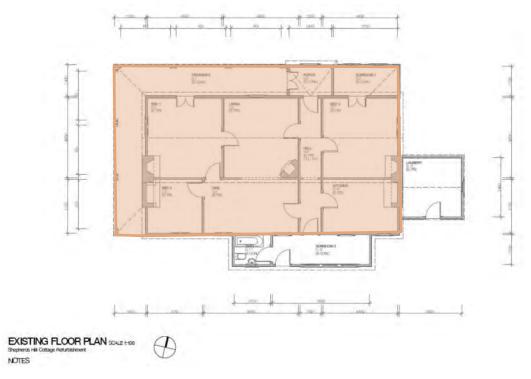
Existing floor plan of the cottage, showing the layout of the building and sections of the cottage that date from the 1890s, from the third period of development (highlighted in orange). Note the fireplace to the living room and north-eastern sunroom are a later addition. (Source: Curran, drawing no. A100, revision A, 2 August 2017)
